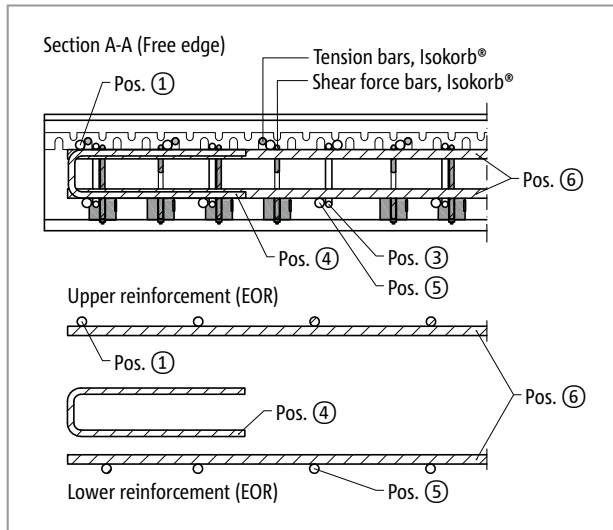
Schöck Isokorb® T Type CK: Section A-A Depiction of free balcony edge
